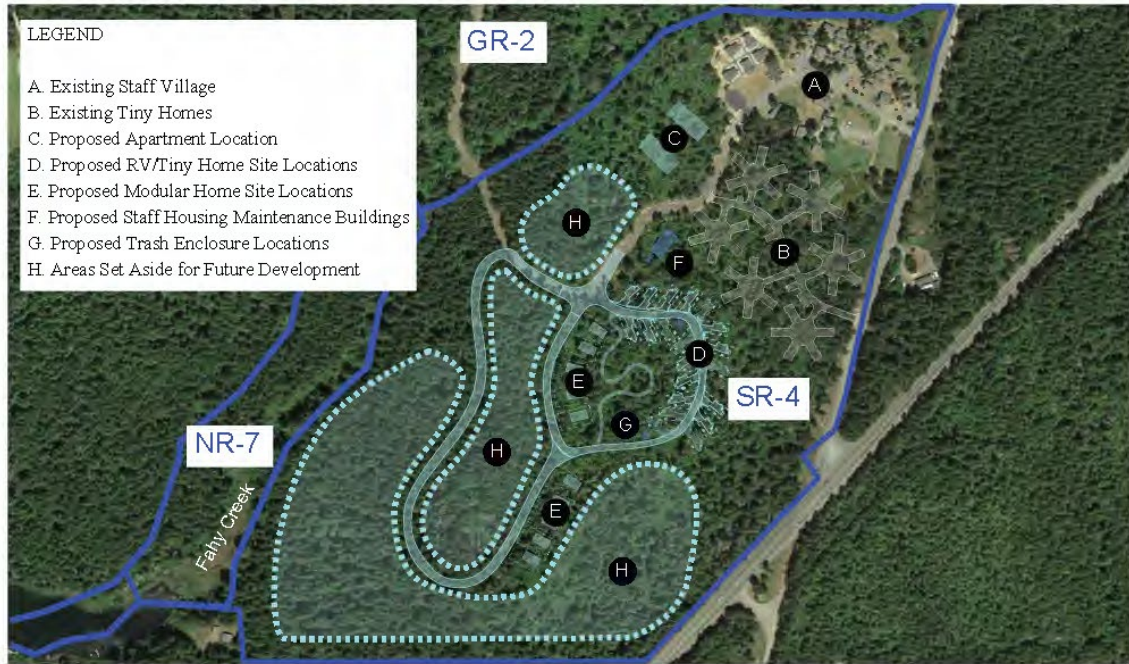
STAFF HOUSING EXPANSION MASTER SITE PLAN
